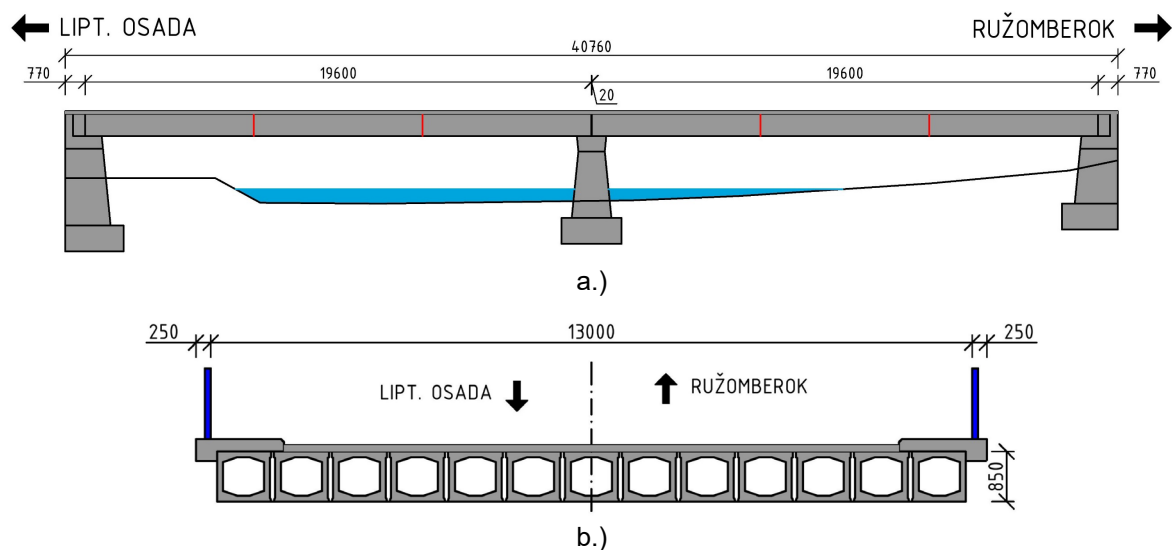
Bridge “C” Ruzomberok: a.) Longitudinal section; b.) Cross-section.
